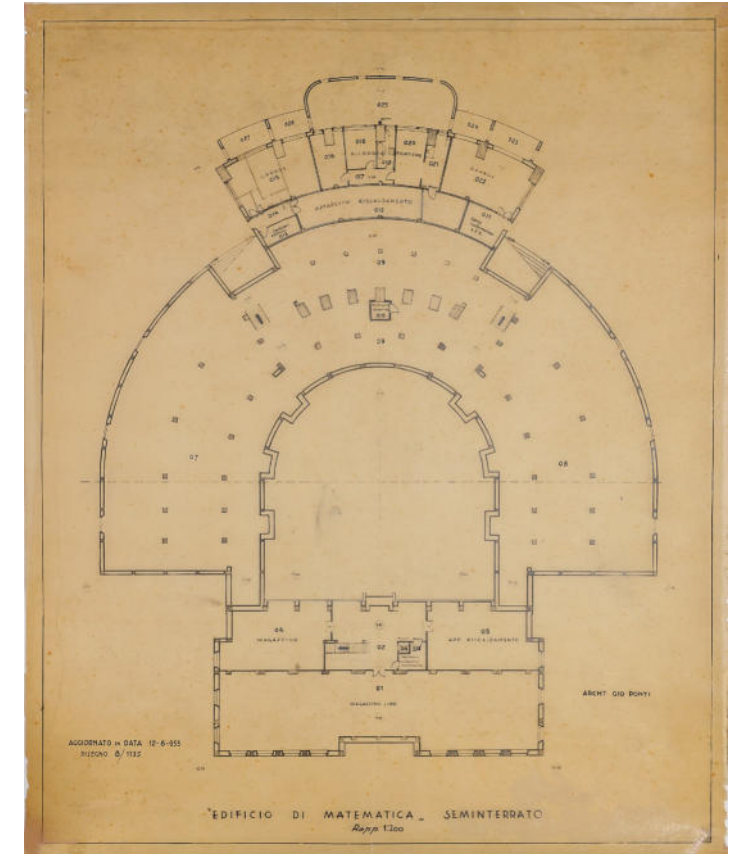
Plan of the basement designed by Ponti in June 1935; details are provided regarding the house of the porter and his family, located at the foot of the classroom tower with its systems and garages (ASS_drw_69)
